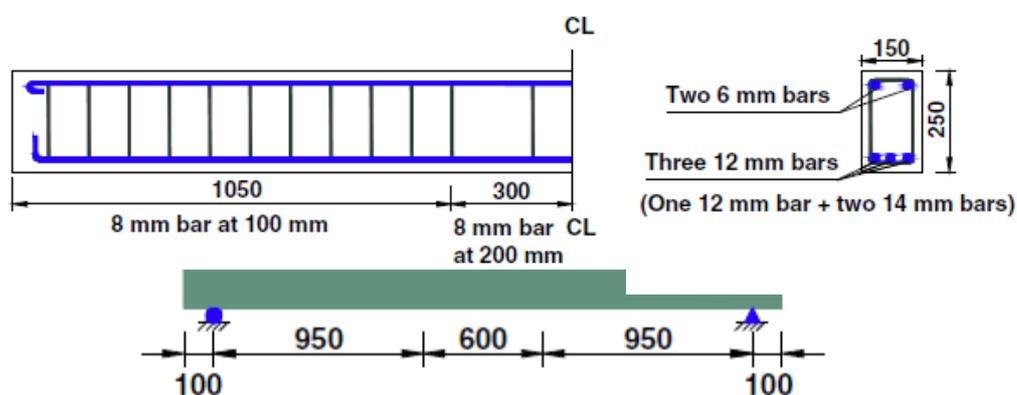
Reinforcement details of the concrete beam specimens (dimensions :mm)
